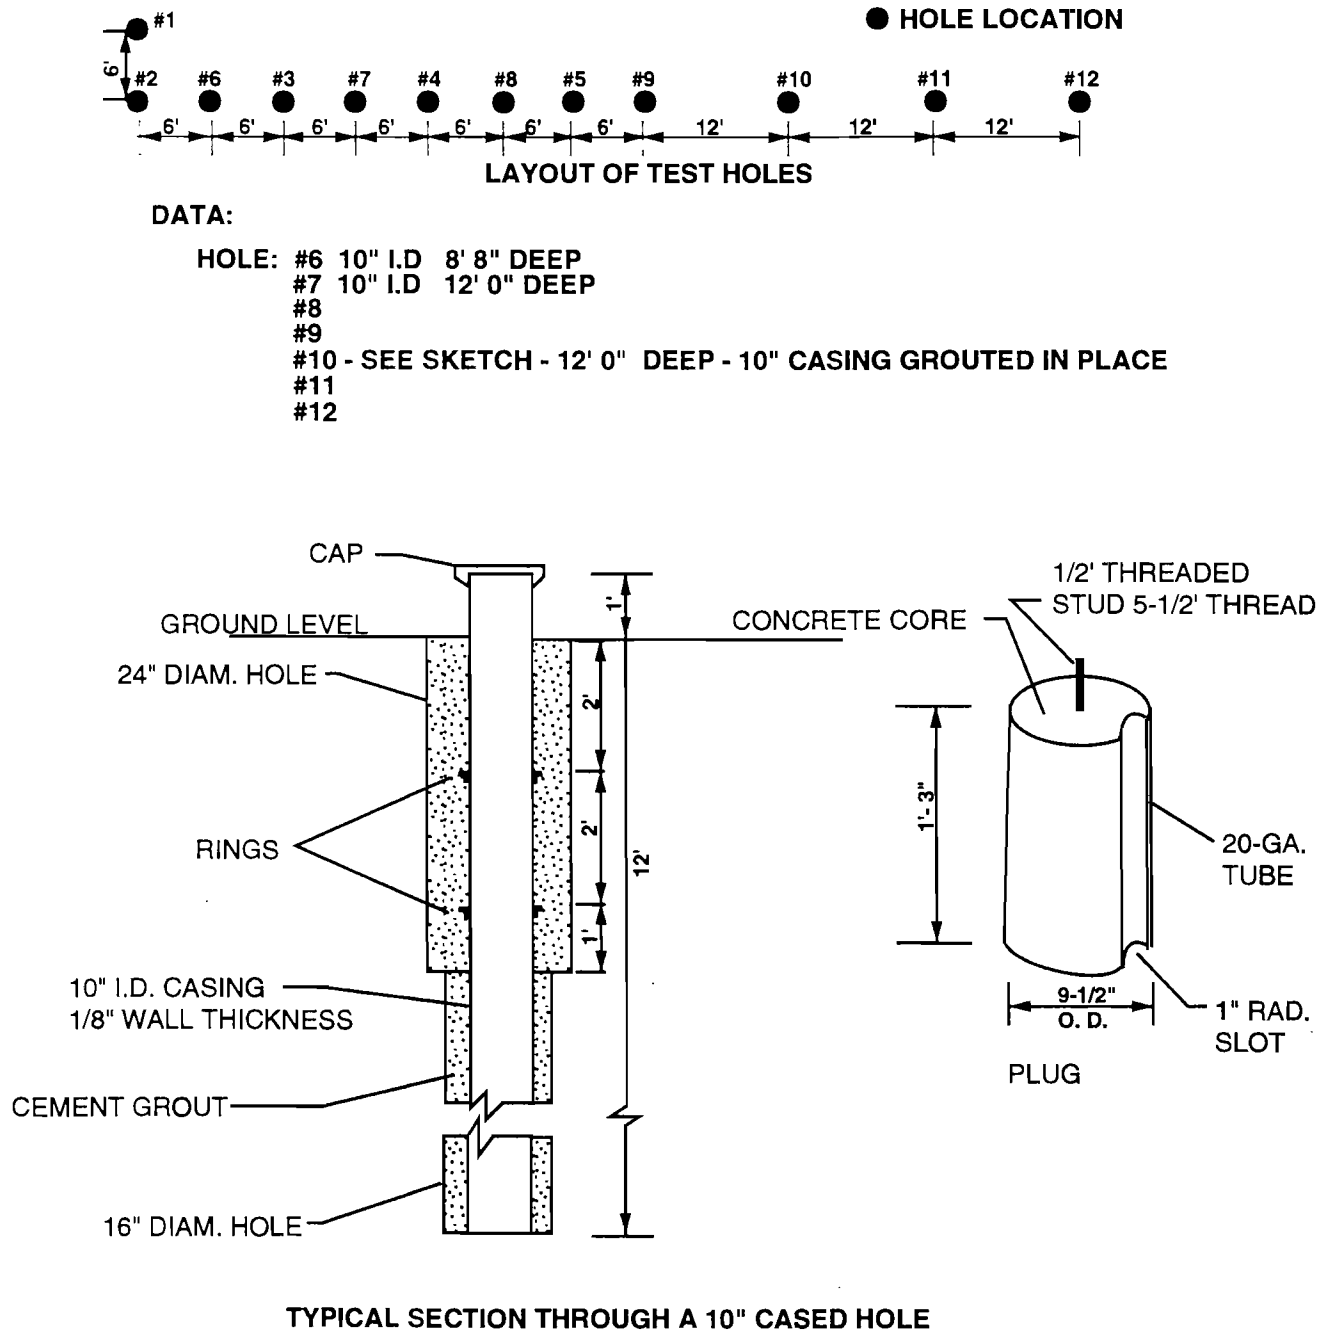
Layout and hole construction information for the small-scale shot area (adapted from Laboratory Engineering drawings).
